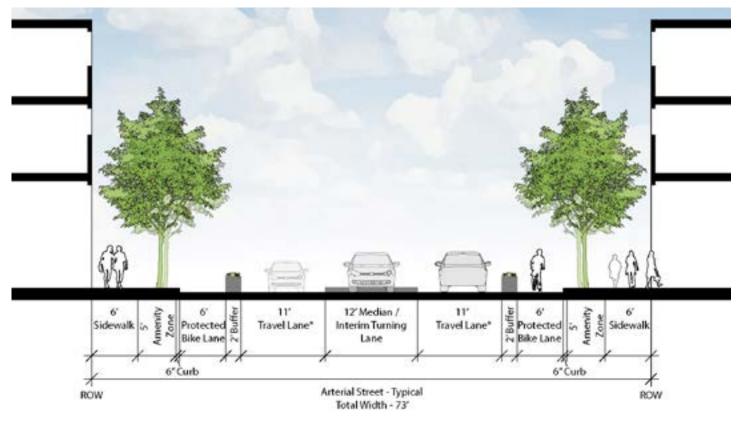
Arterial Street Typical Section. Note: Arterial streets can accommodate 1-2 travel lanes in each direction. If a second lane is needed, the lane closest to the curb should be 11' in width and the lane farthest from the curb should be 10' in width. 130th Avenue NE north of Spring Boulevard is considered a Shopping Street and follows different standards and design guidelines. Sections of 124th Ave NE and Spring Boulevard have a different section particularly the location of bike lanes. Where bike lanes are adjacent to sidewalk areas, a buffer with directional tiles is necessary between the bike lane and pedestrian areas.
